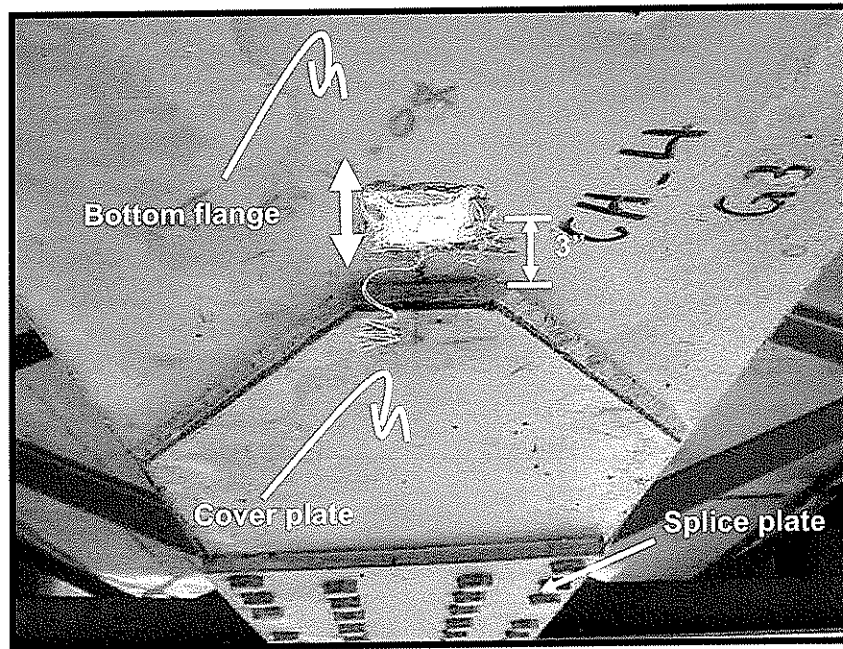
CH_4 installed in span 2 at P.P. 9 on the bottom face of the bottom flange of girder G3 (3 inches away from weld toe)
